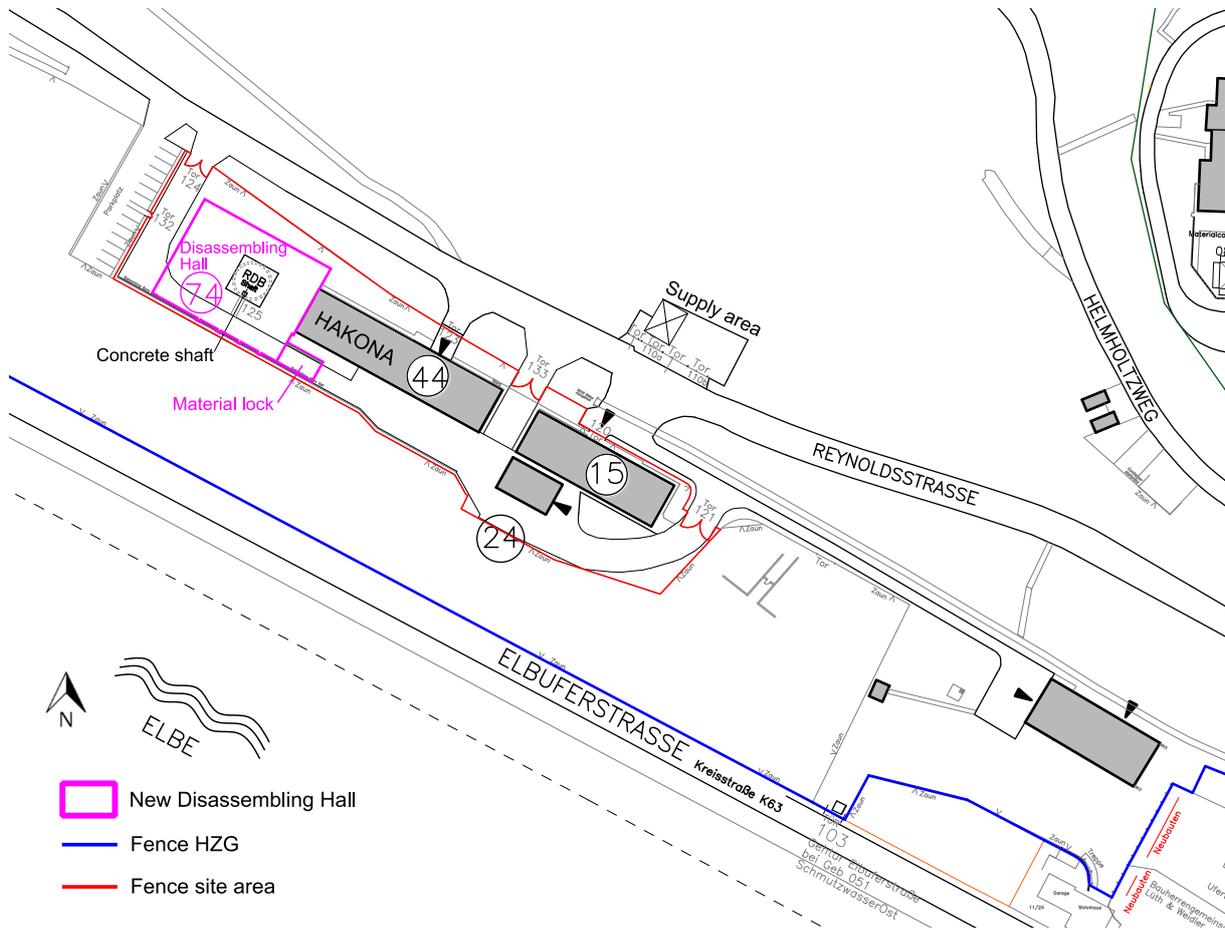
Location of the concrete shaft with the RDB-OH and the to be built Disassembling Hall
